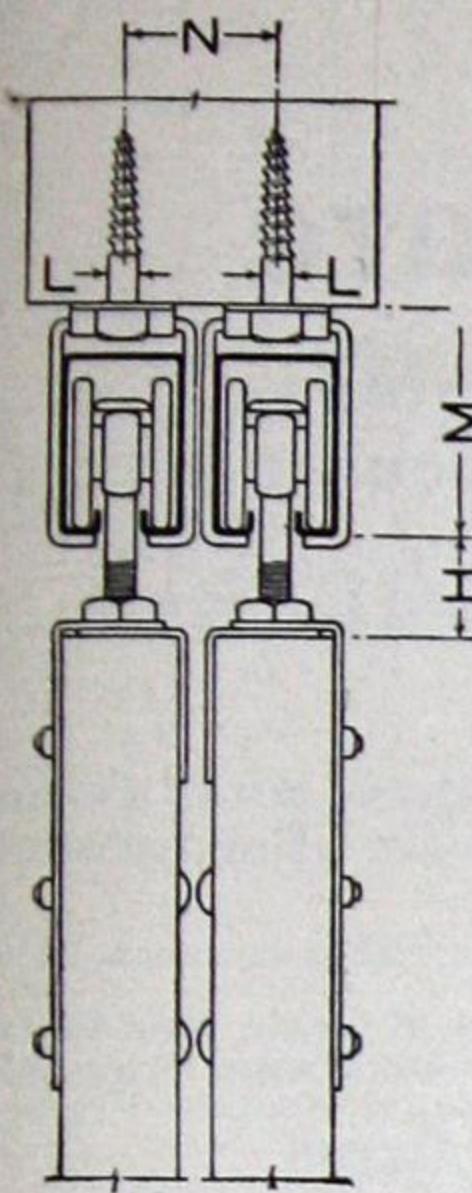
Cross-section showing overhead bracket attachment, without weatherstrip, of two parallel sliding doors. See page 96 for dimensions.
